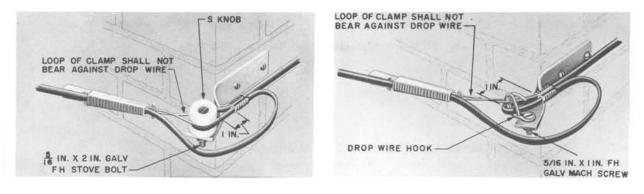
First Attachment - House Bracket (Drop Wire Run in Vertical Direction on Building)
